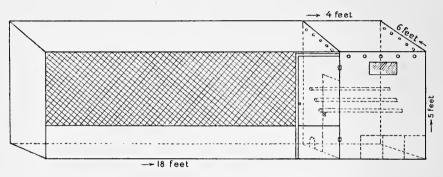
FRONT VIEW OF HOUSE AND RUN.
